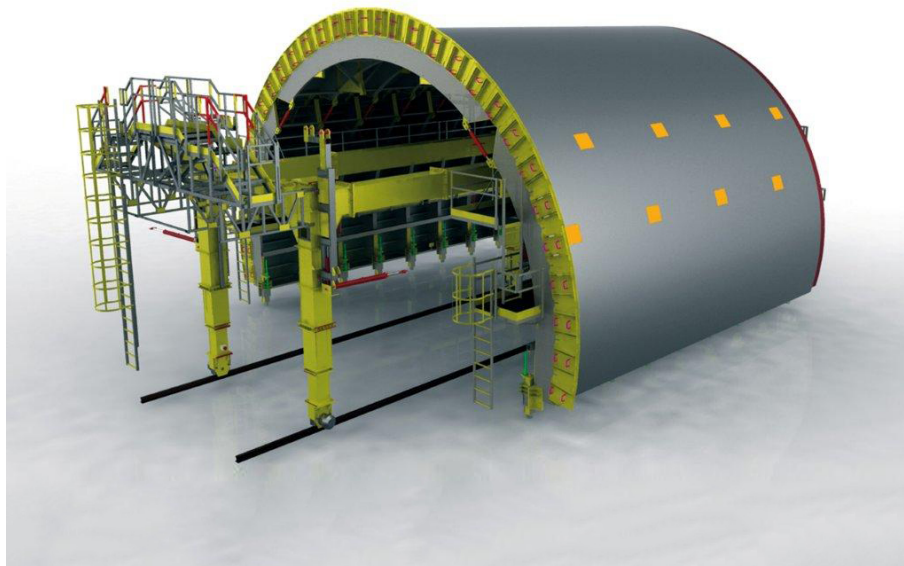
Non-telescoping travelling formwork. Technology by Rubrica www.rubricaingenieria.es
